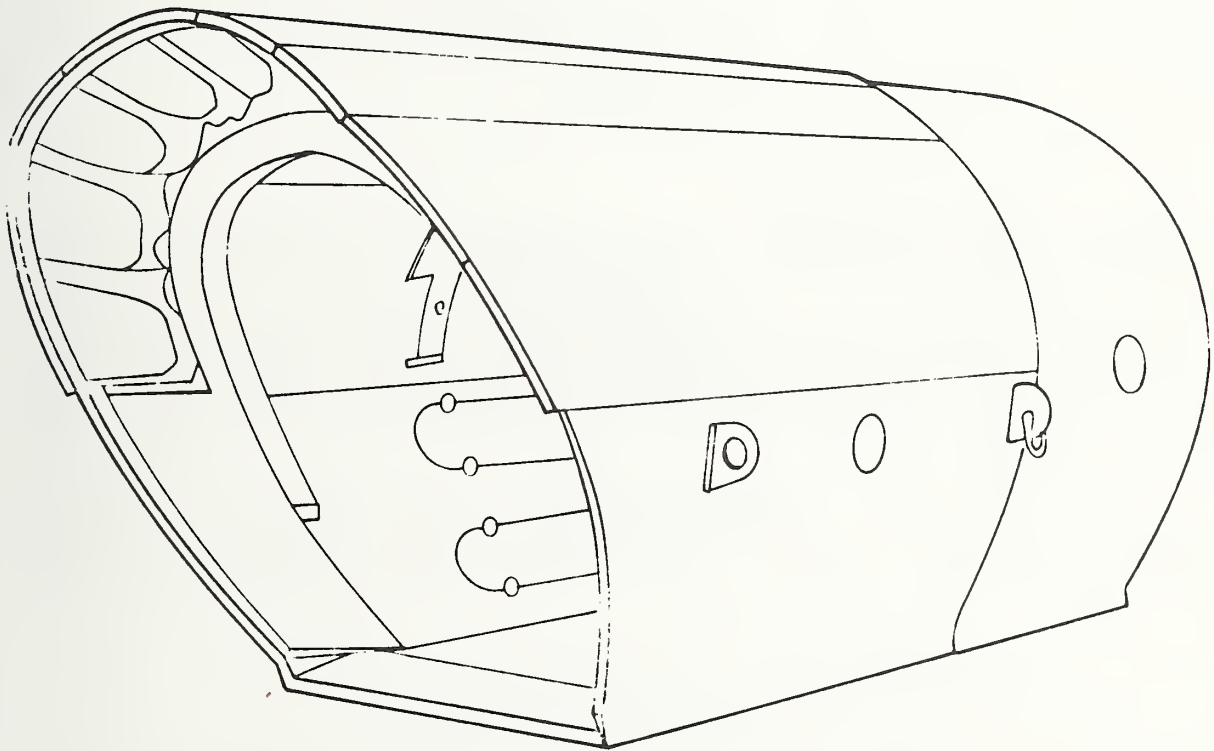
TYPICAL SOFT GROUND SHIELD
